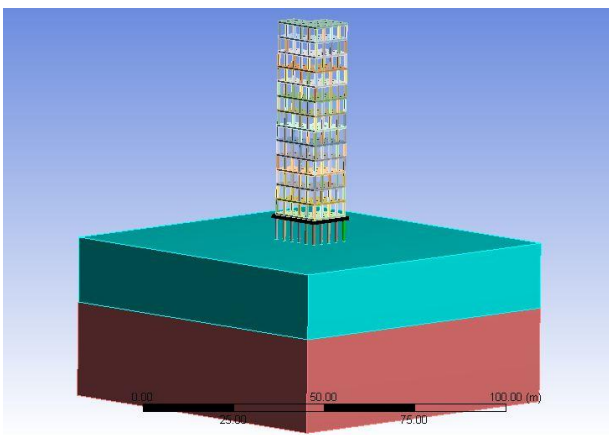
Model of the structure with pile foundation (hiding 1st layer of soil)
